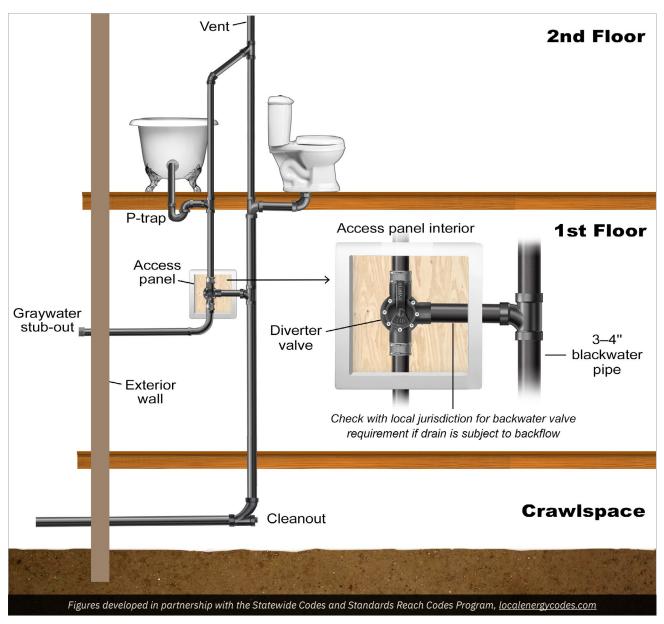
Dual Drainage Plumbing: Single fixture on second floor near exterior wall
